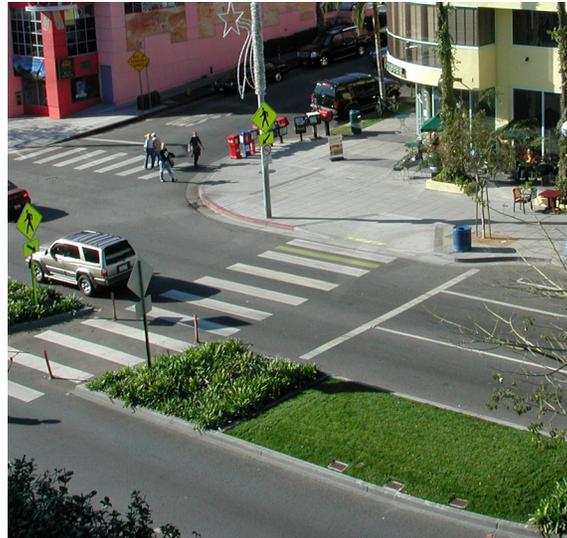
Curb bump-out at striped crosswalk in West Hollywood.
